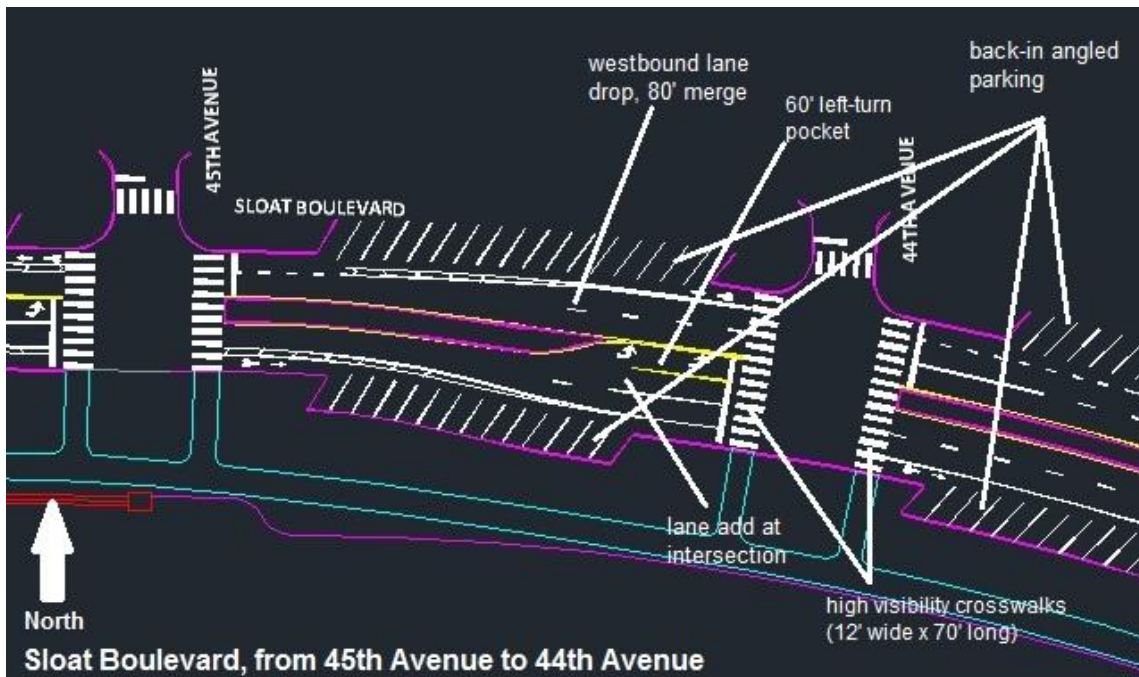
Sloat Boulevard, from 45th Avenue to 44th Avenue
